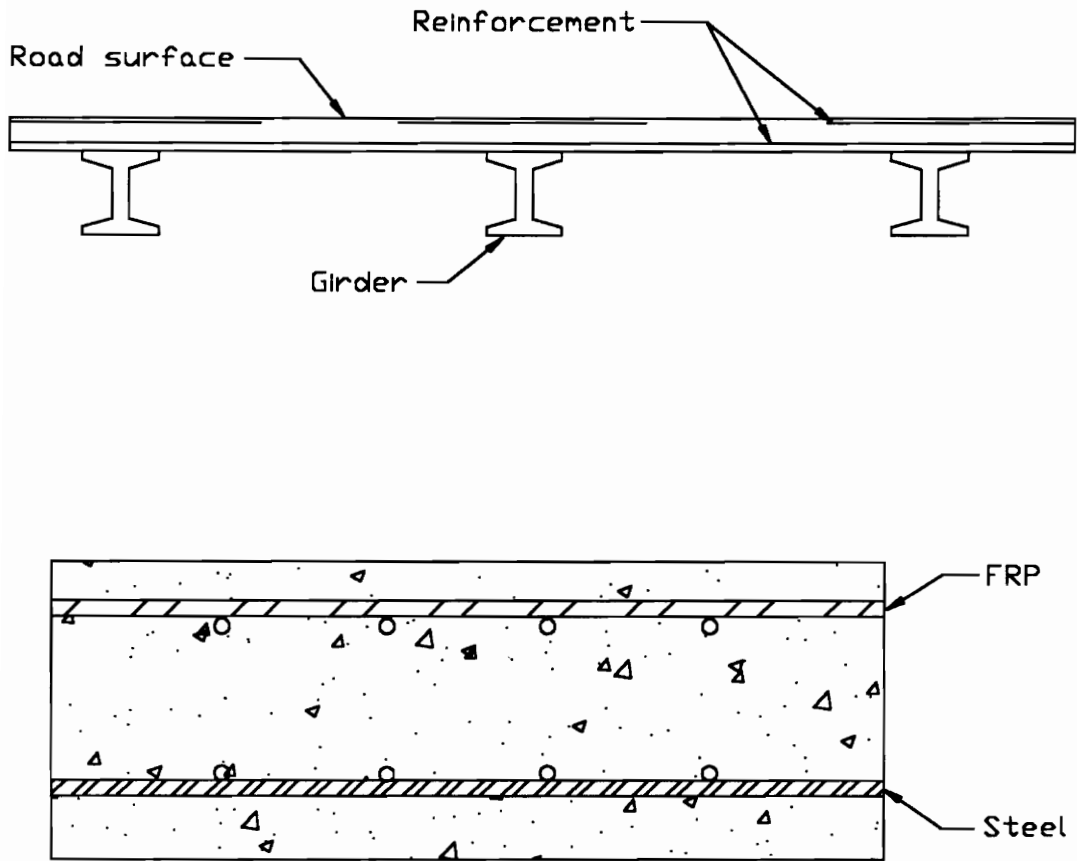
Bridge Deck Incorporating Steel and FRP Reinforcement
